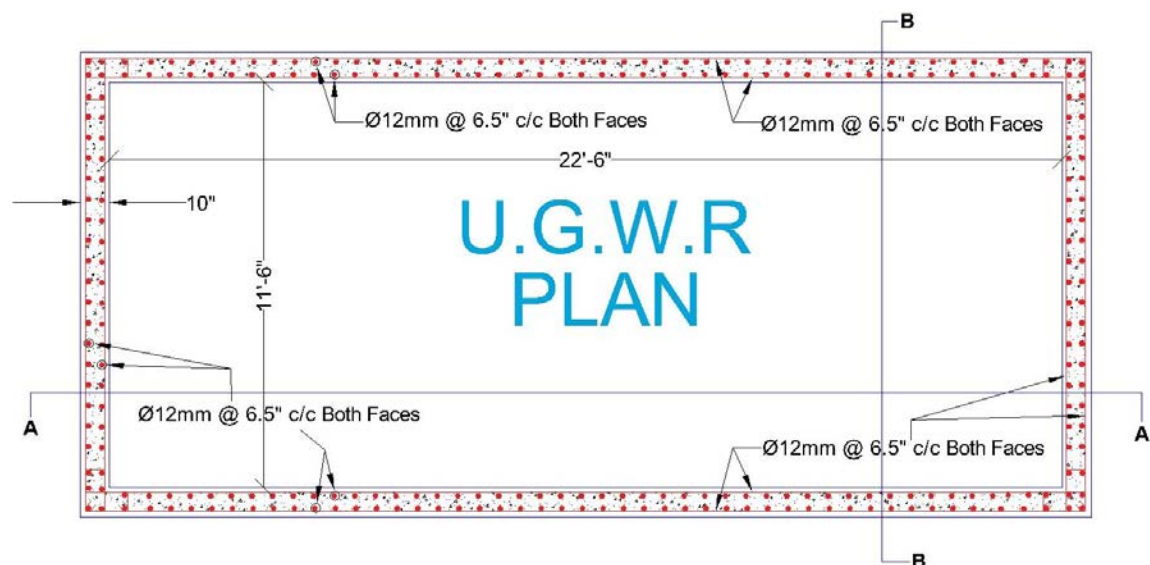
Details of reinforcement arrangement of Wall of the underground water reservoir.
